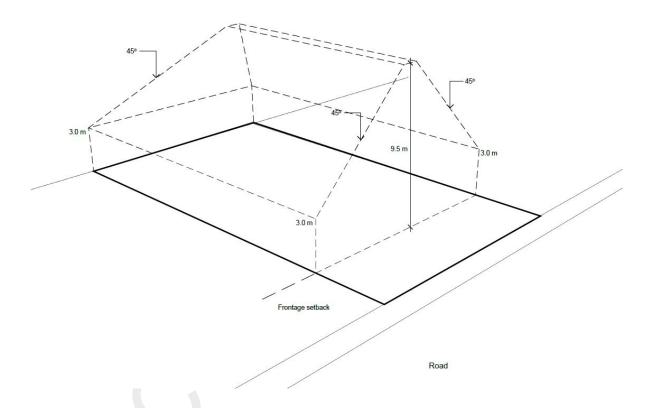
Building envelope as required by clause 9.4.2 A3(a) and clause 9.5.1 A2(a)
